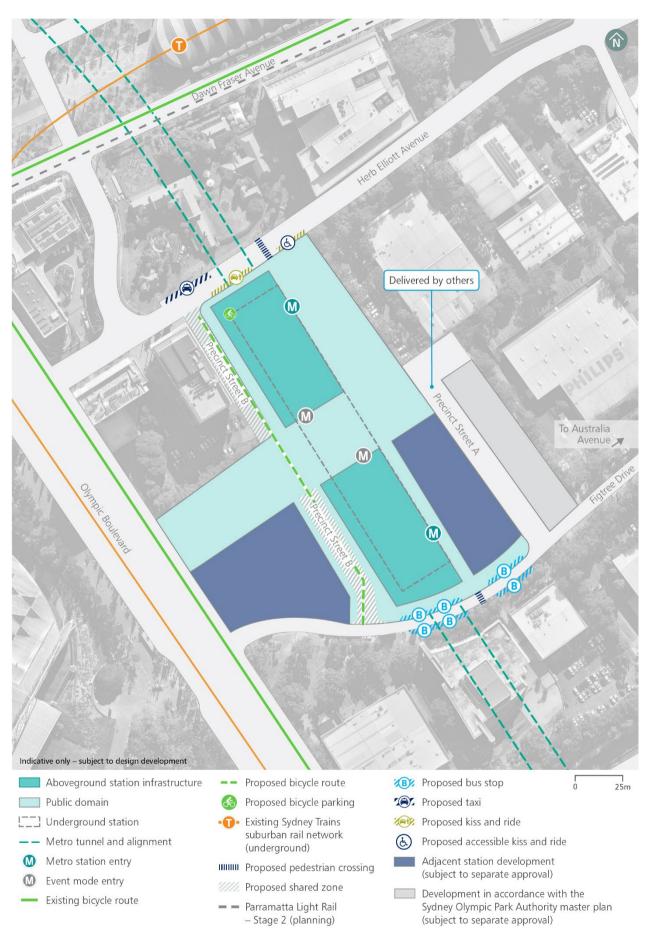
Revised indicative site layout and key design elements – Sydney Olympic Park metro station
